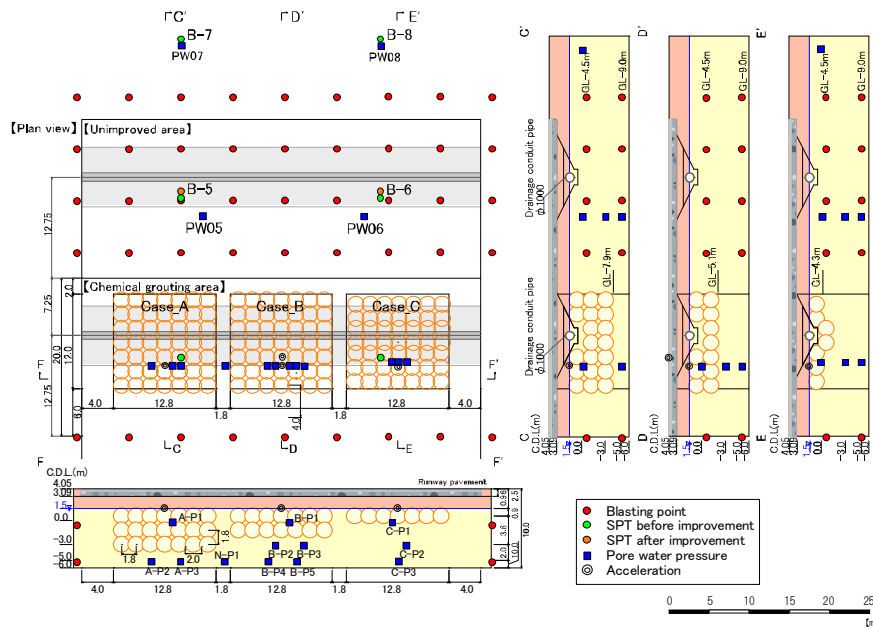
Plan and section view of Chemical grouting area (Case_A, B and C)
